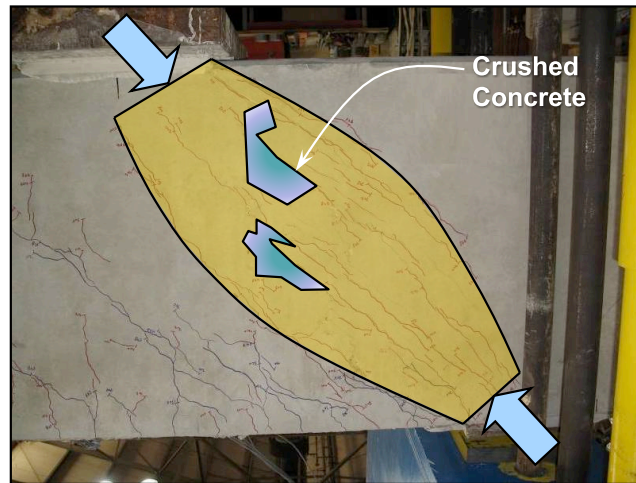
Direct strut or one-panel shear failure ($a/d = 1.2$).
